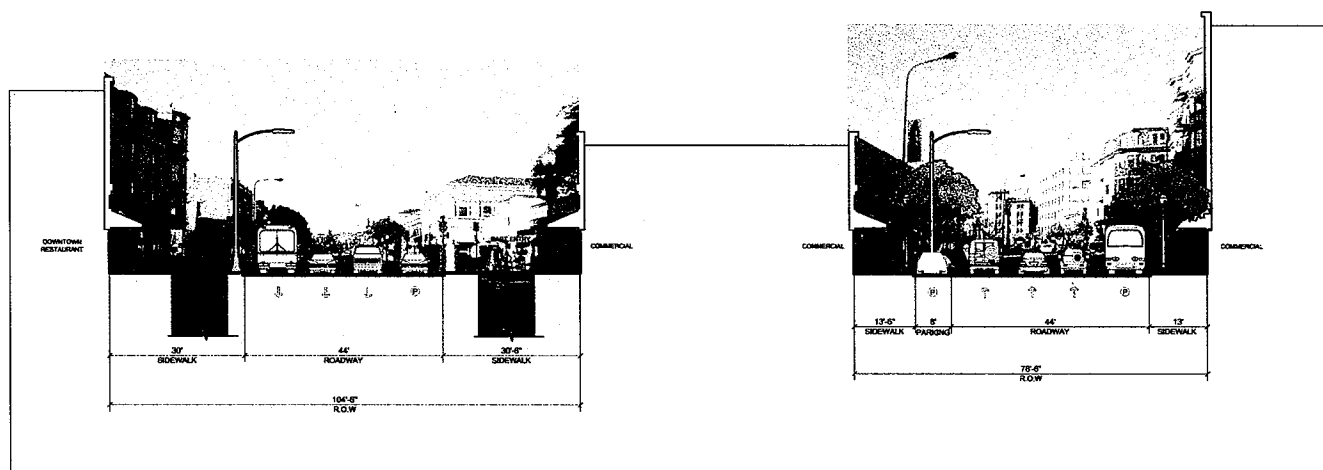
Section through the Shattuck Avenue couplet, north of Center Street continuing to University Avenue.
